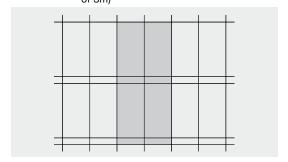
Skirt Panel (Floor to Floor in Excess of 3m)
